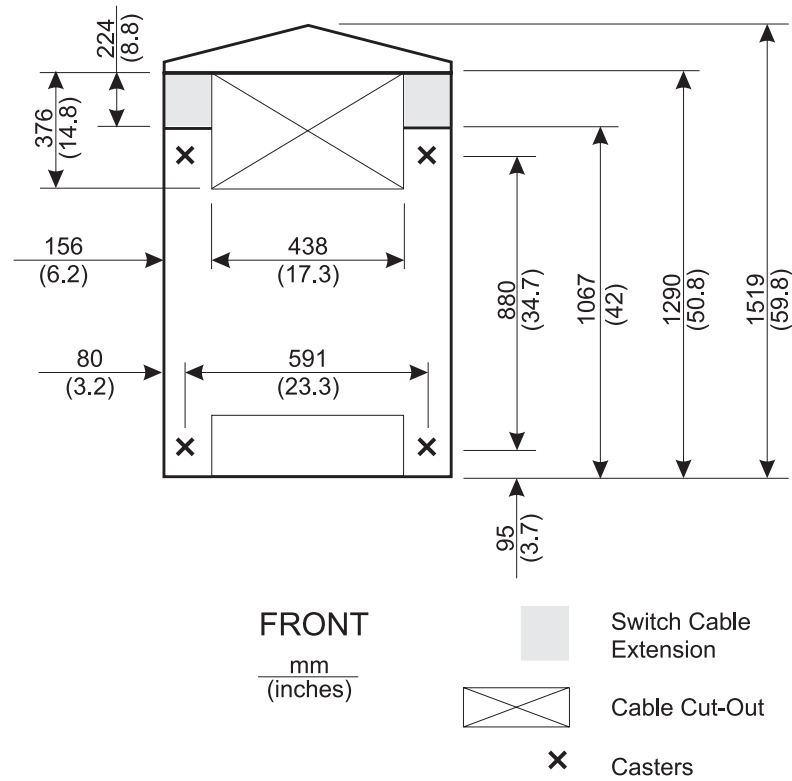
1.93 m SP Switch frame: cable cut-out dimensions and caster locations (not to scale).
